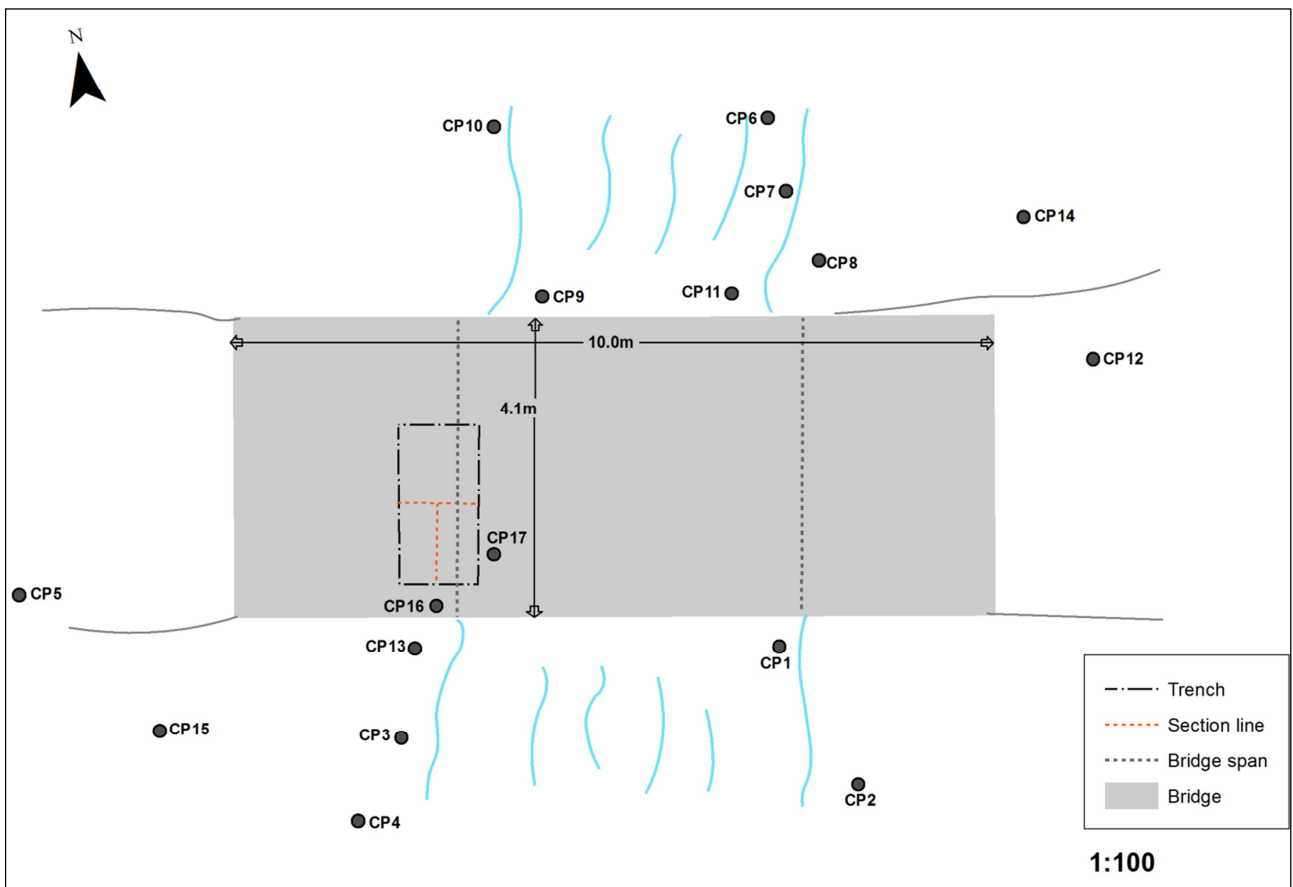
Sketch plan of Bridge 009 showing trench location and camera positions marked by "CP"
